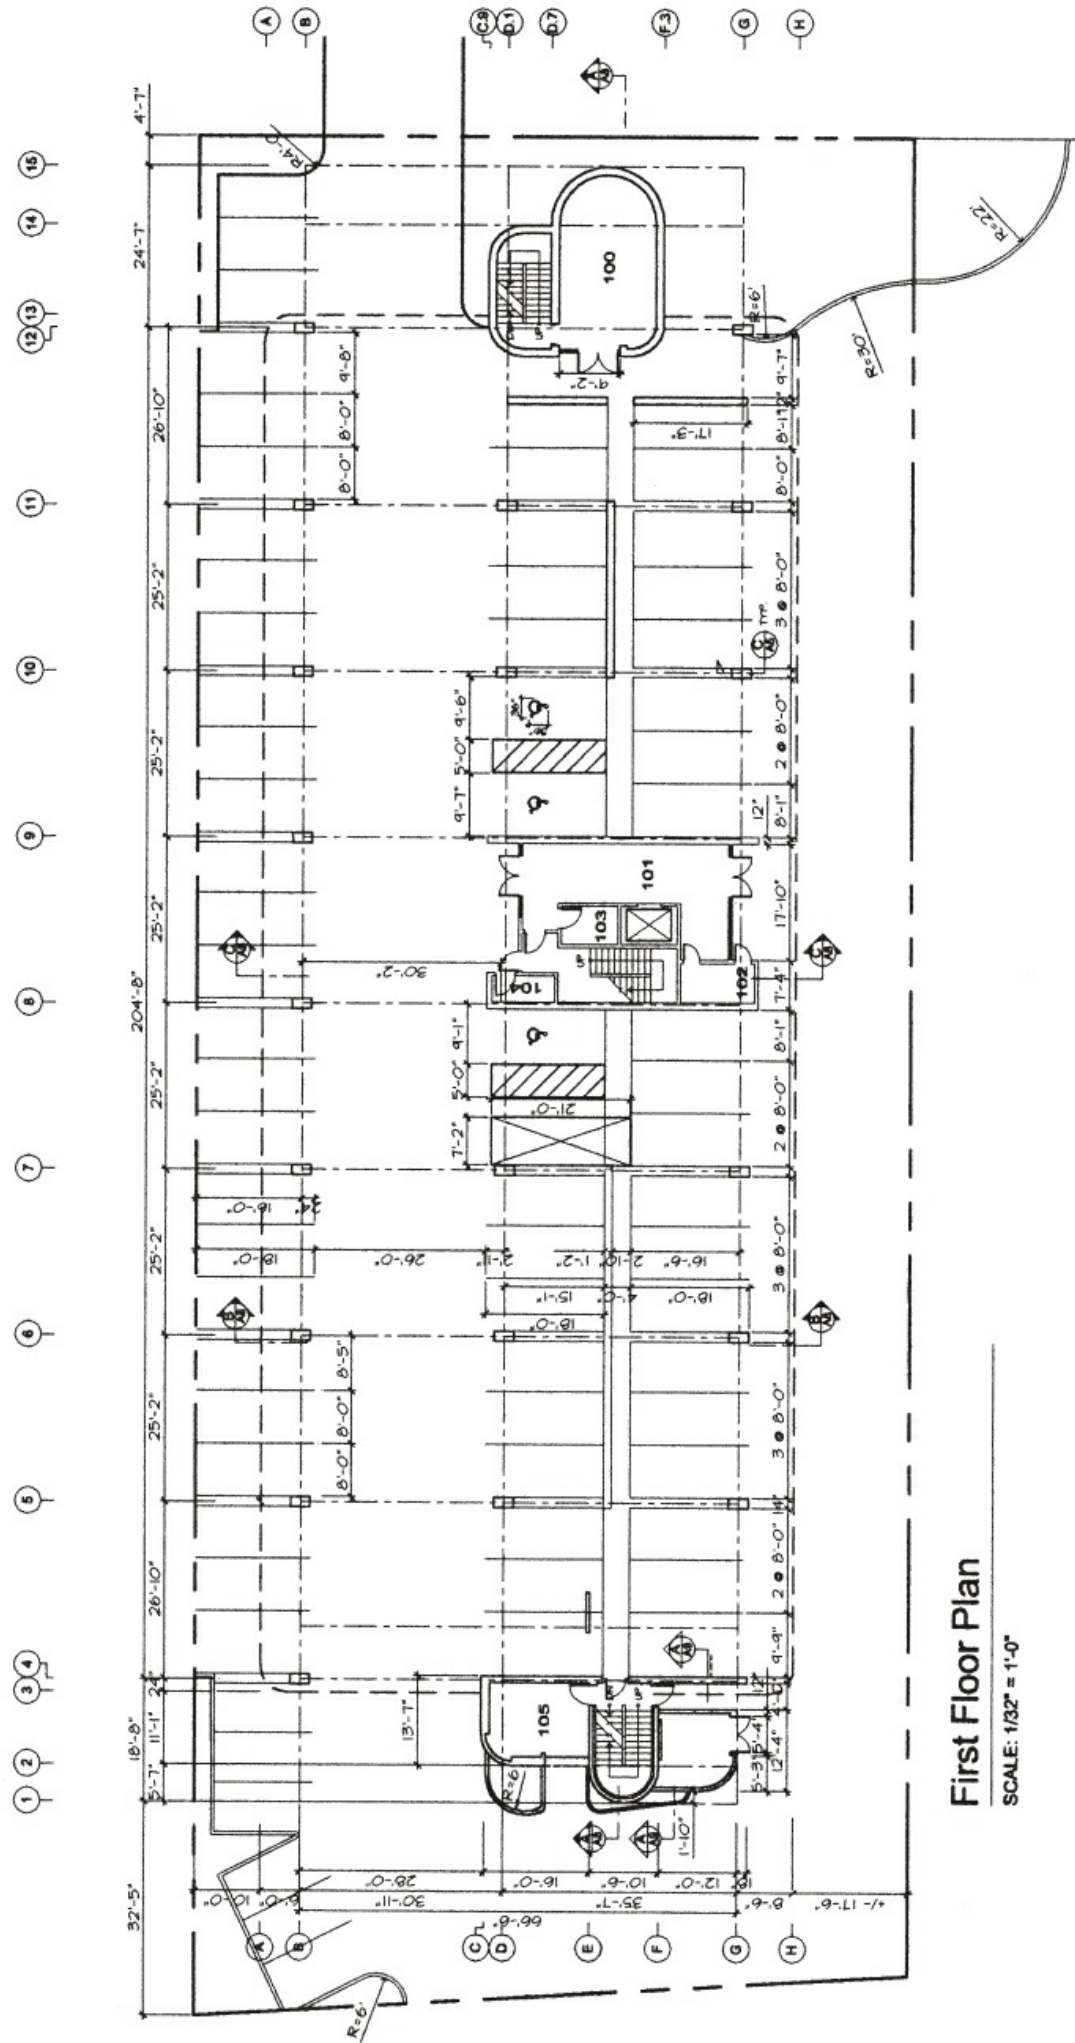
(#) Madison Building—Stage V: Working drawing—ground...floor plan.
